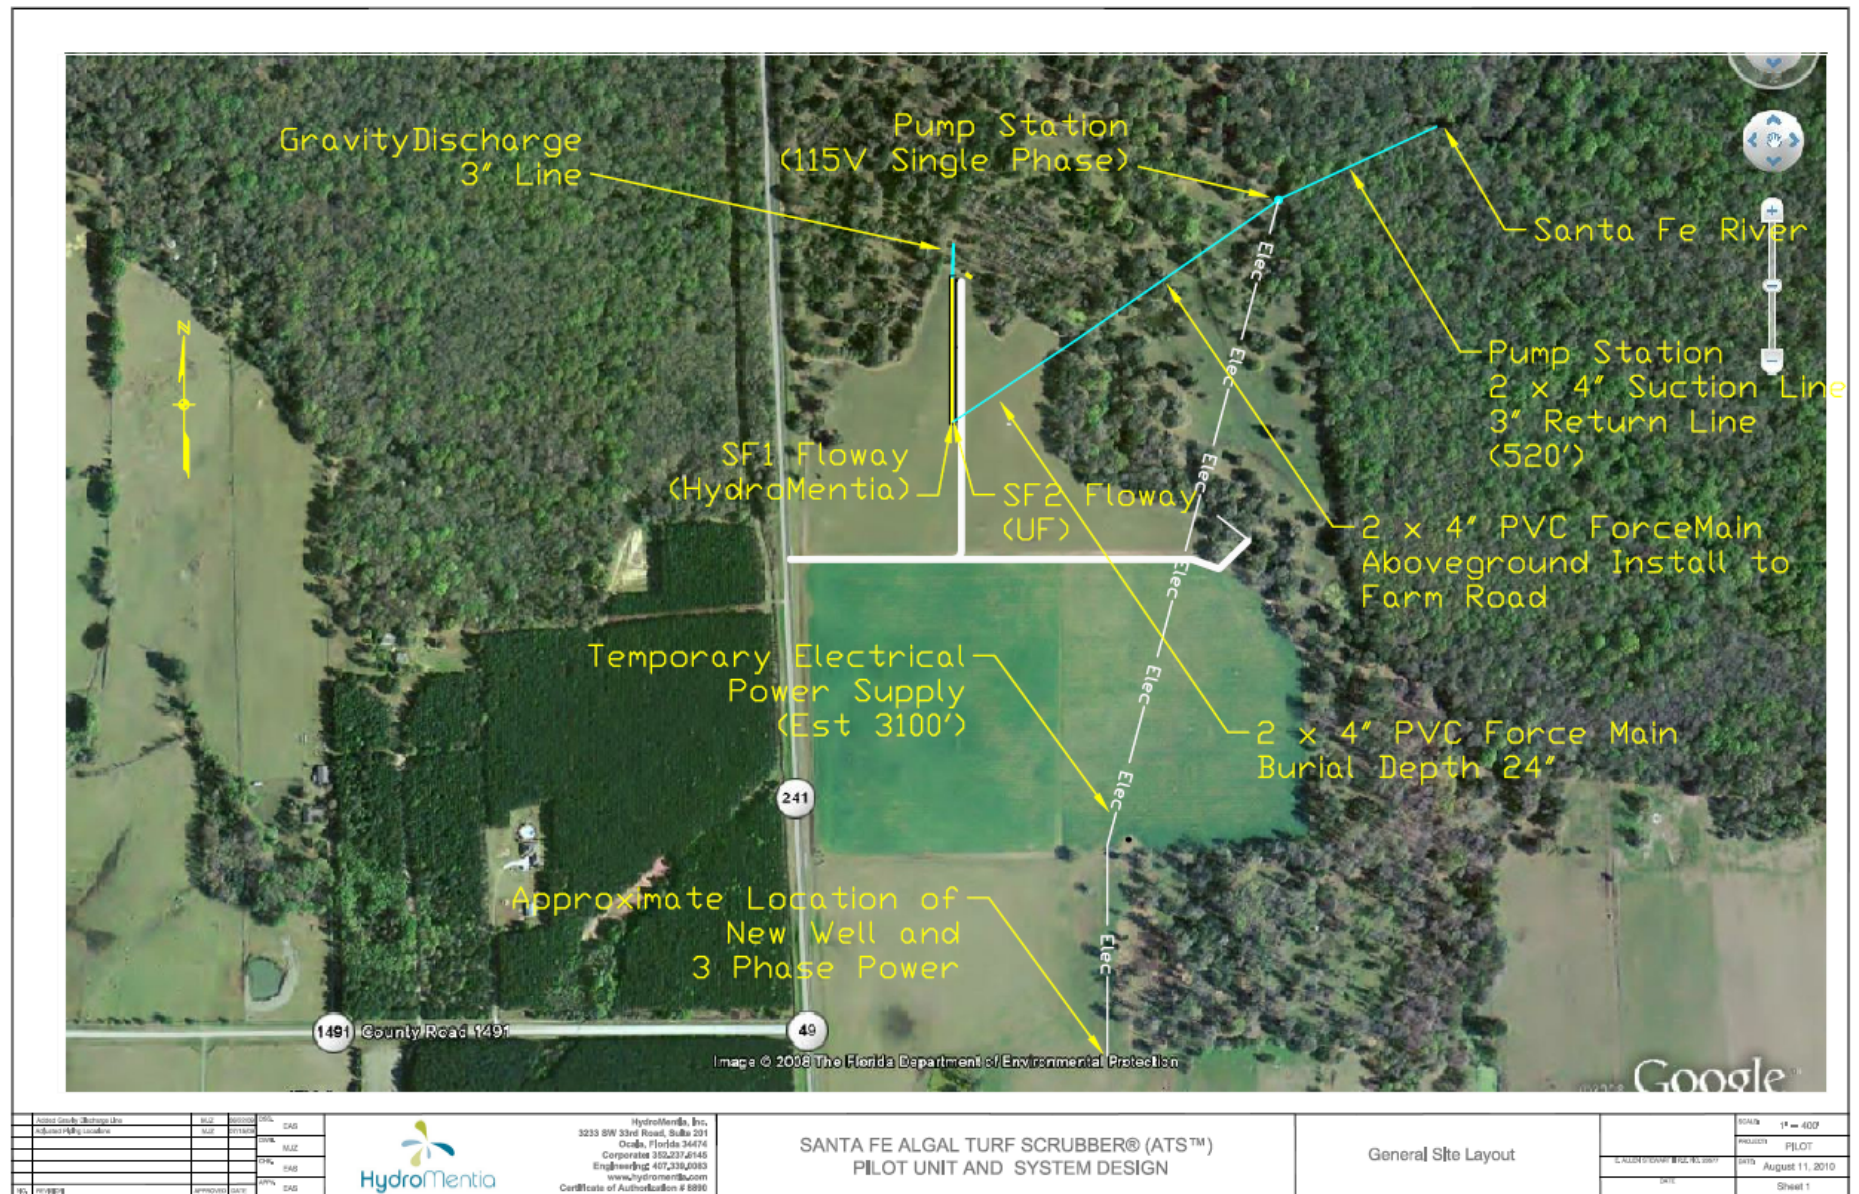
General Site Layout Santa Fe ATS™ Pilot Program (Schematic Not to Scale)
